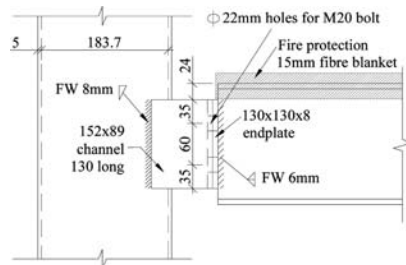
Geometrical details of reverse channel connection in Test 10 of Ding and Wang (2007).
